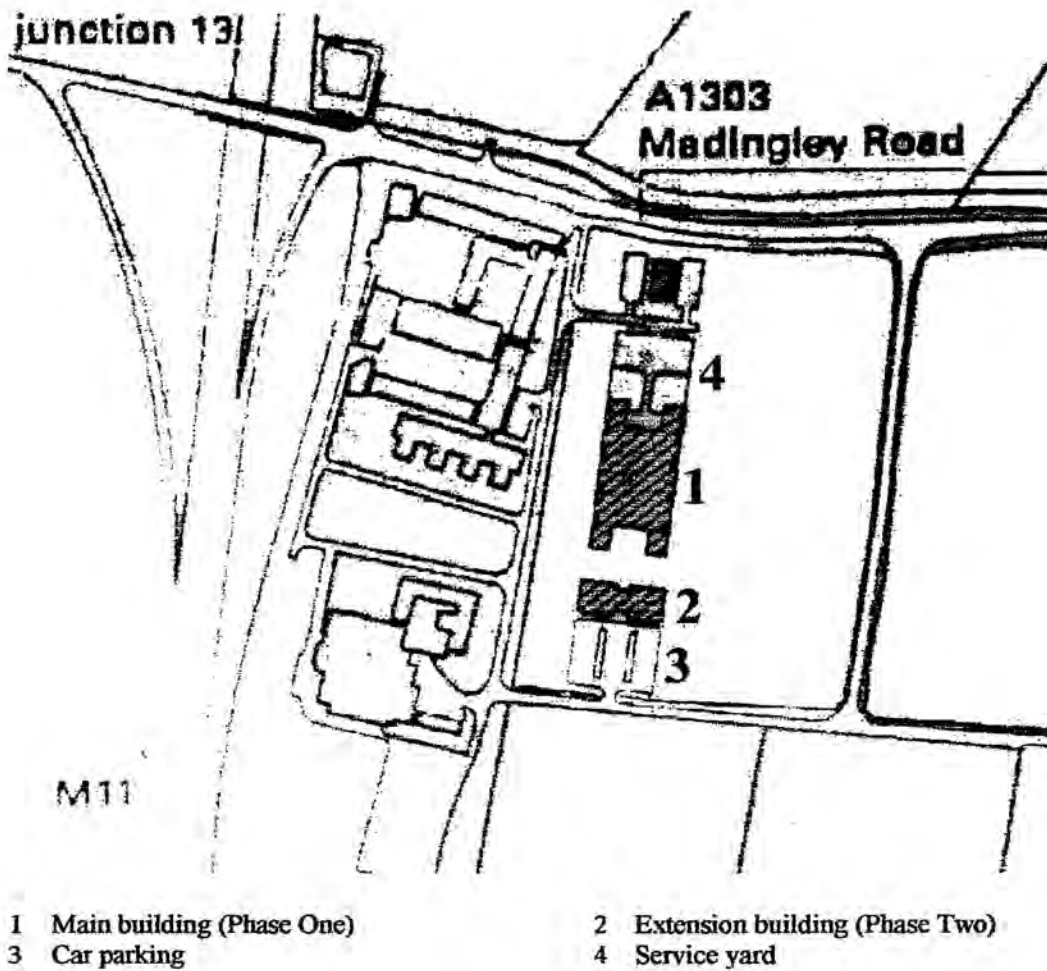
Site plan of the Schlumberger Cambridge Research Centre
